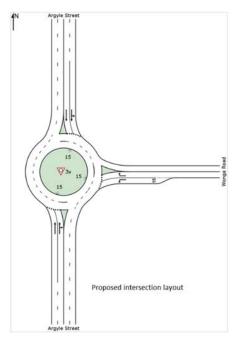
Wonga Road and Argyle Street Intersection – Proposed Roundabout Design
